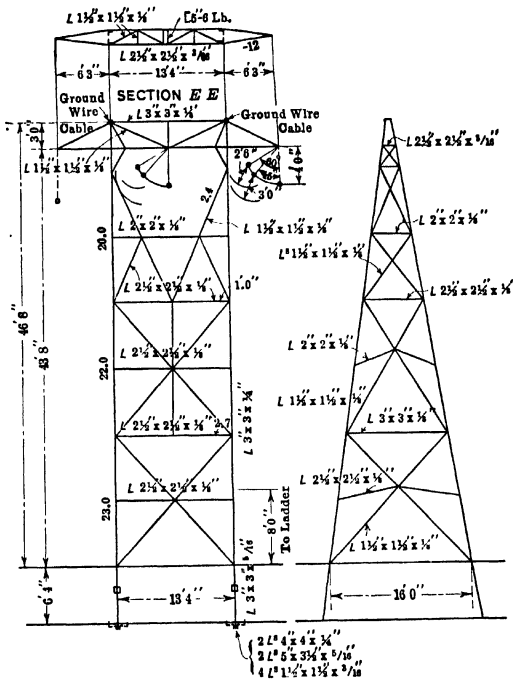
General dimensions of 53-ft. single-circuit tower.
